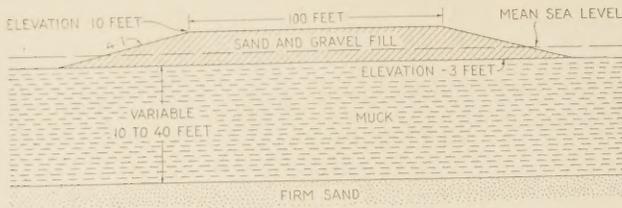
FILL SECTION AS DESIGNED AND CHARACTER OF UNDERSOIL.
